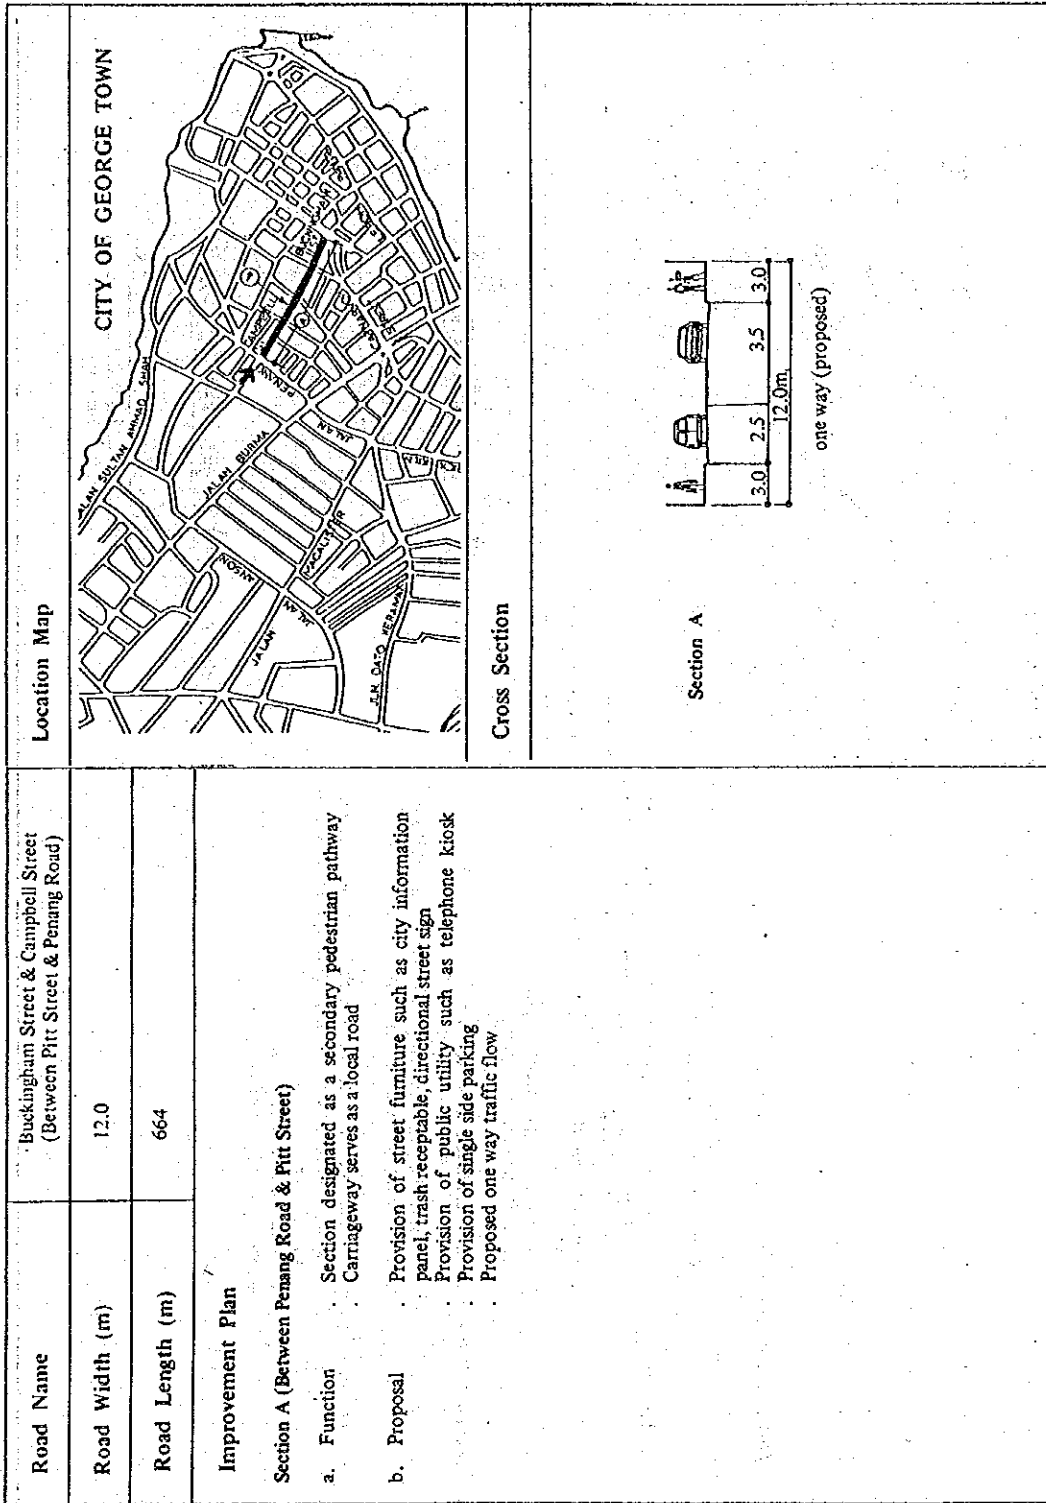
Pedestrianisation Improvement Plan (4) – Buckingham Street & Campbell Street
